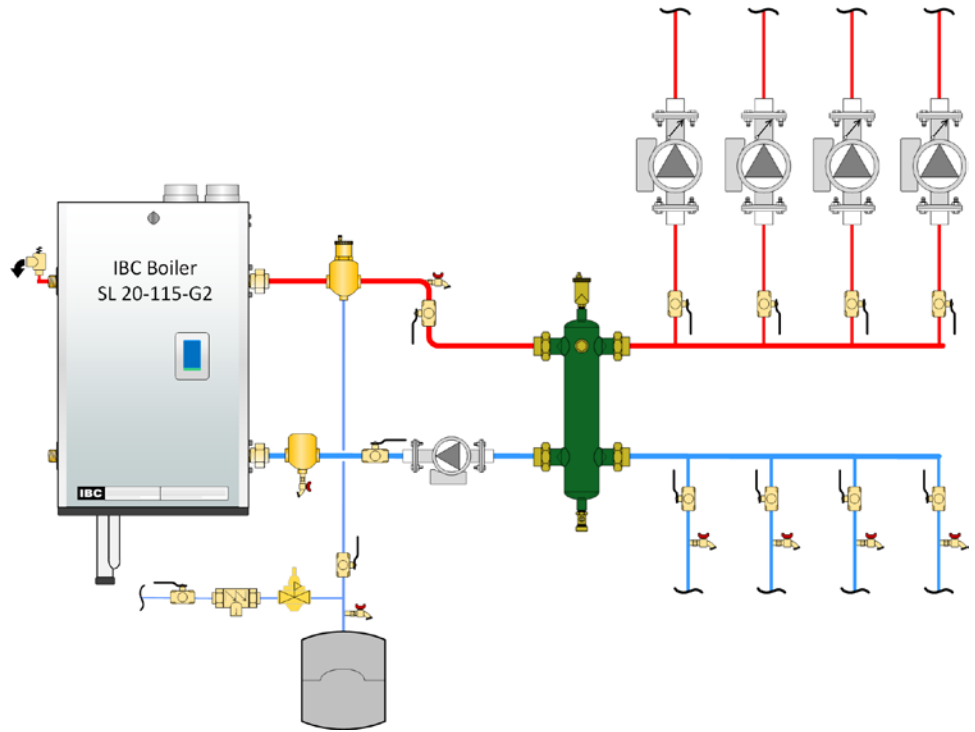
Basic Primary/Secondary piping with hydraulic separator concept
